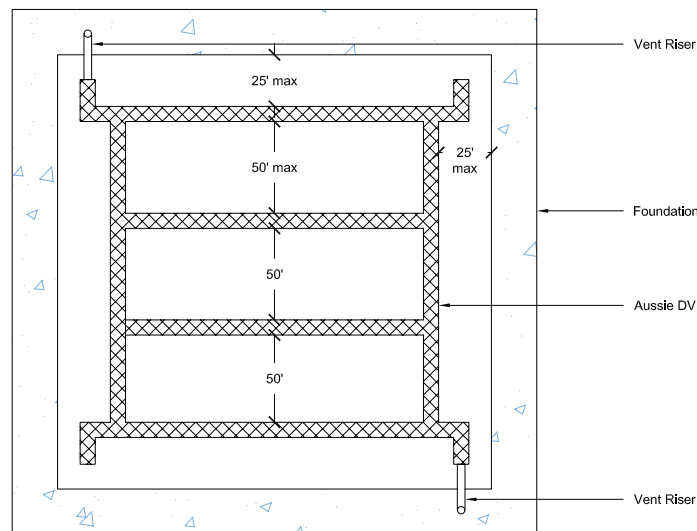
AUSSIE DV VENT LAYOUT – PLAN VIEW
